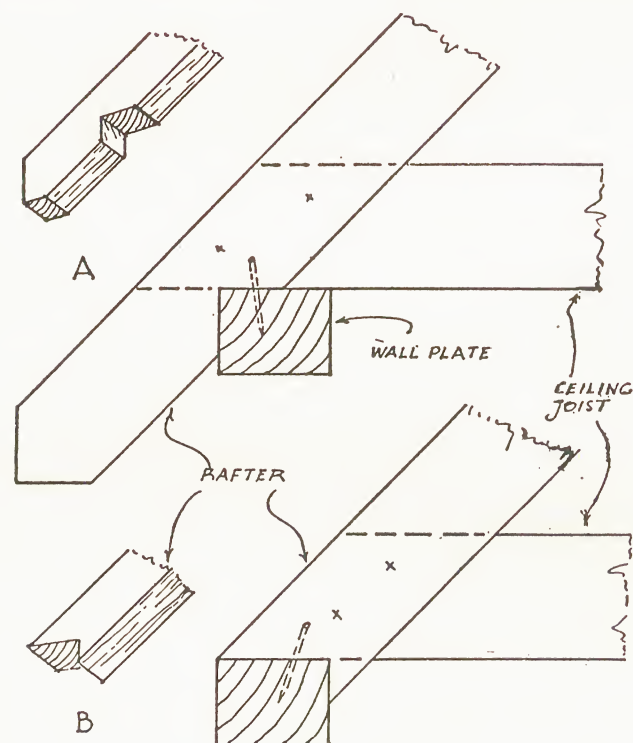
A. Foot of rafter overhanging, secured to wall plate with bird's-mouth notch. B. Bird's-mouth at foot of rafter.
